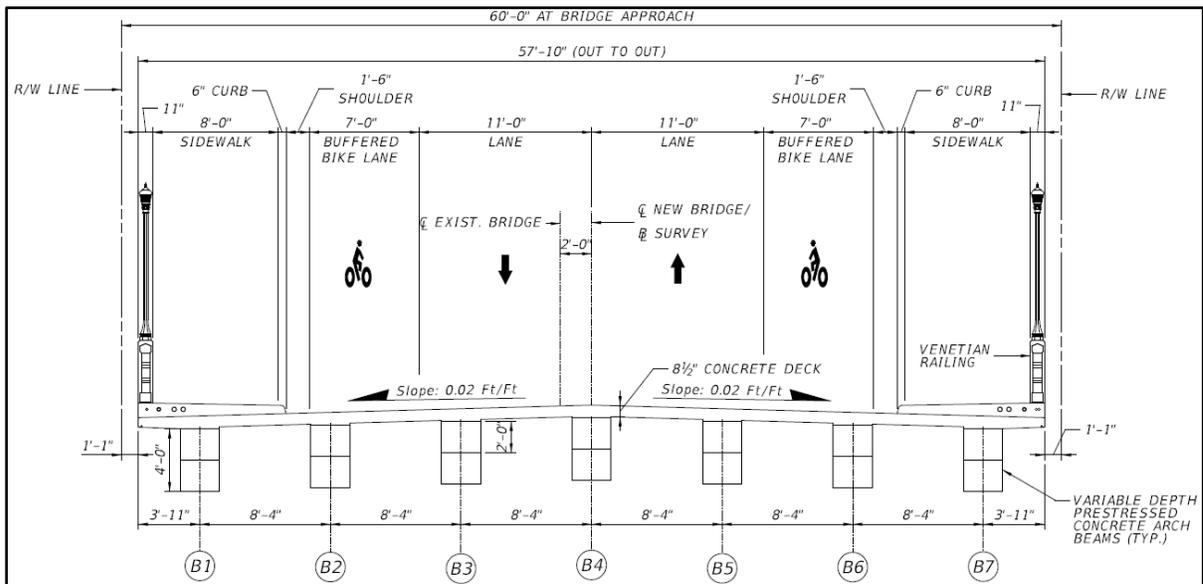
Replacement Alternative 7 - Arched Beam Typical Section
